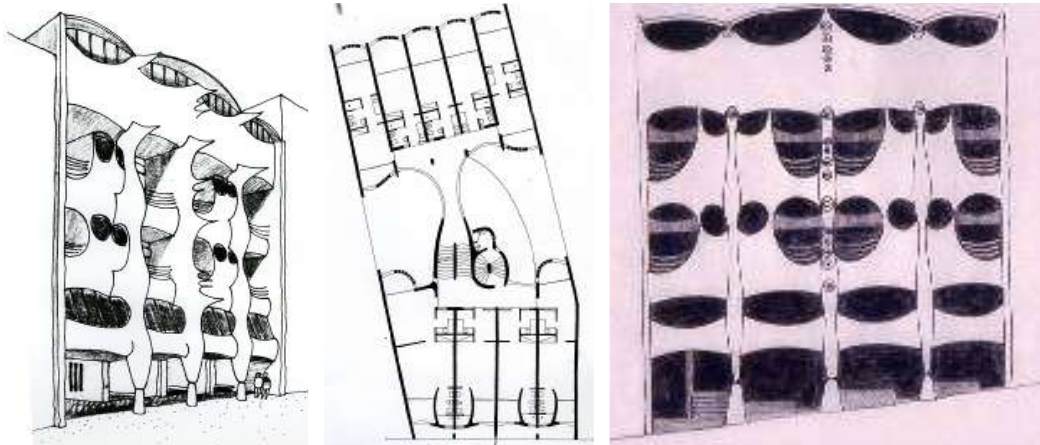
Menino da Silva building, perspective, typical floor plan and elevation.
